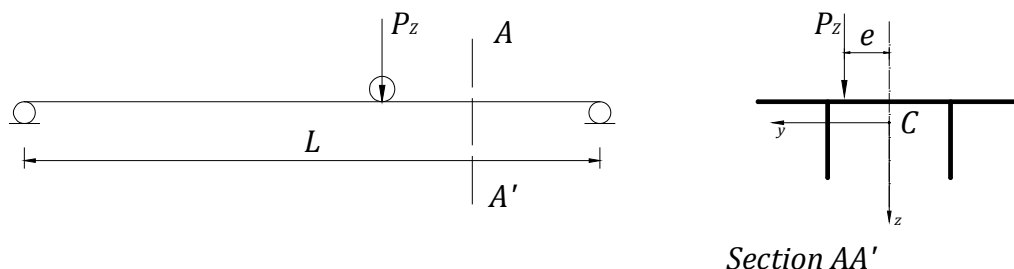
Example of supported beam element acted by a constant and eccentric moving load.
